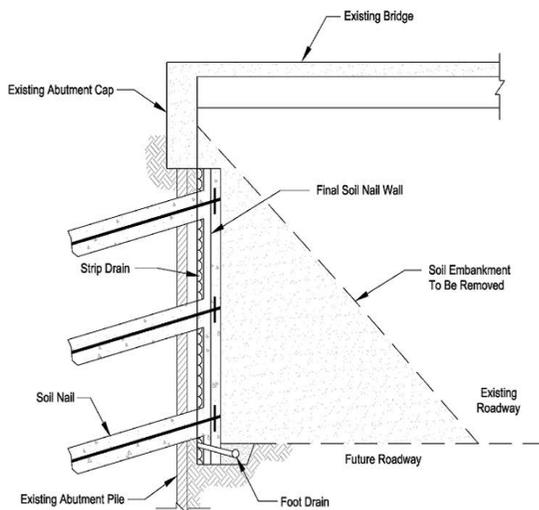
Road Widening under Existing Bridge Abutments (lazarte *et al.*, 2015)
